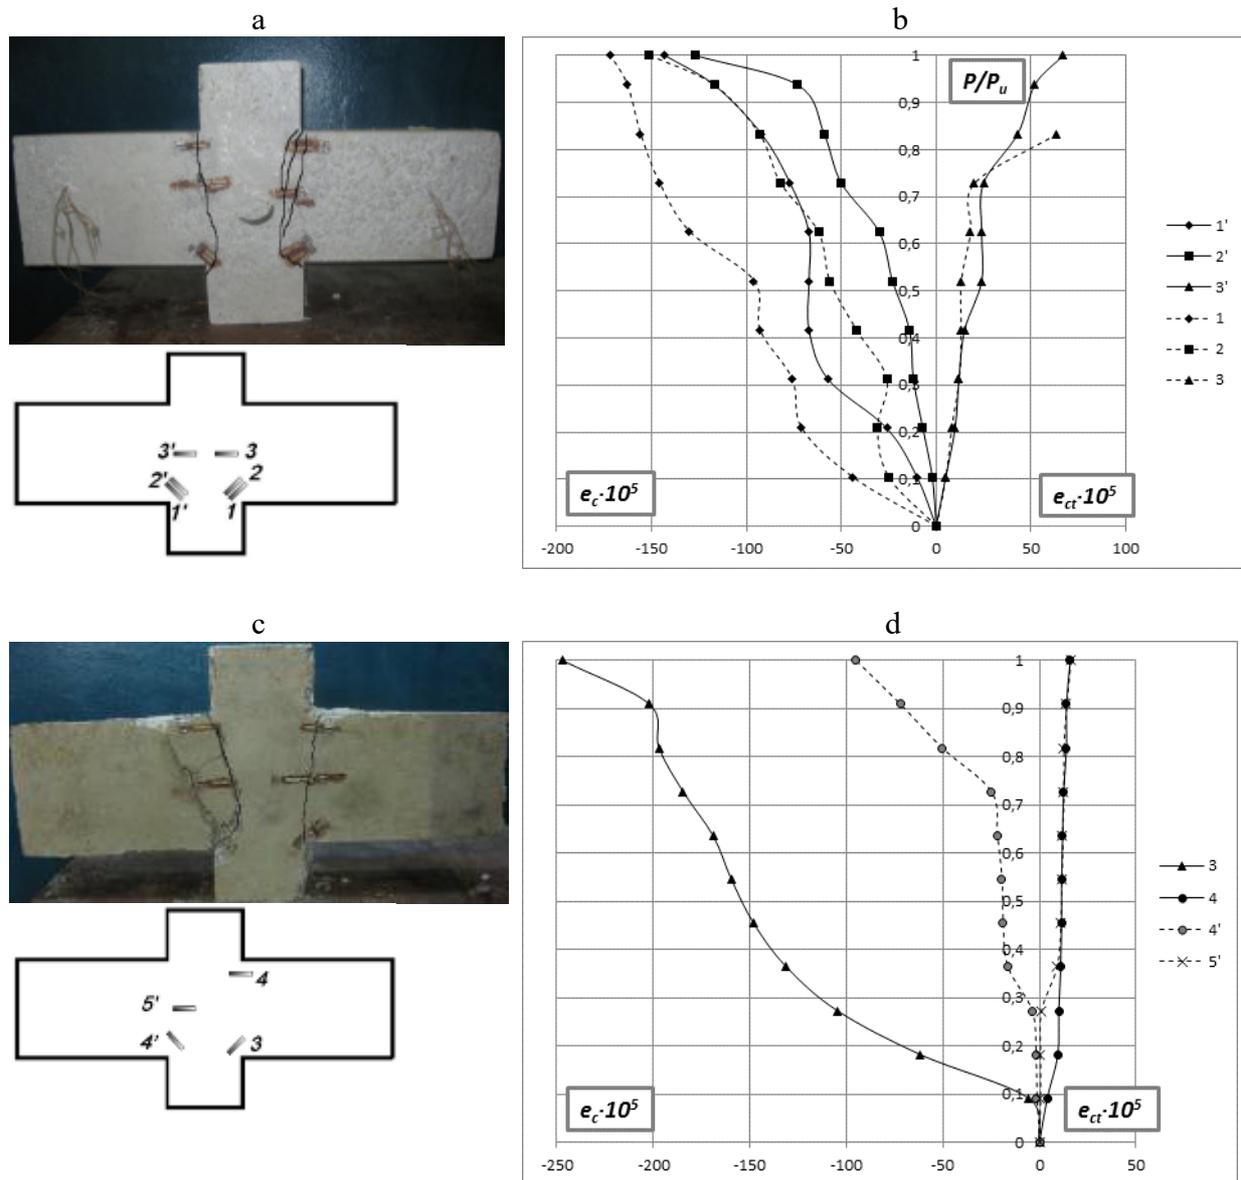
The failure character (a) and diagram « $\varepsilon_c (\varepsilon_{ct}) - P/P_u$ » (b) for reinforced concrete keys with one-level and two-level (c, d) plasing of reinforcement
